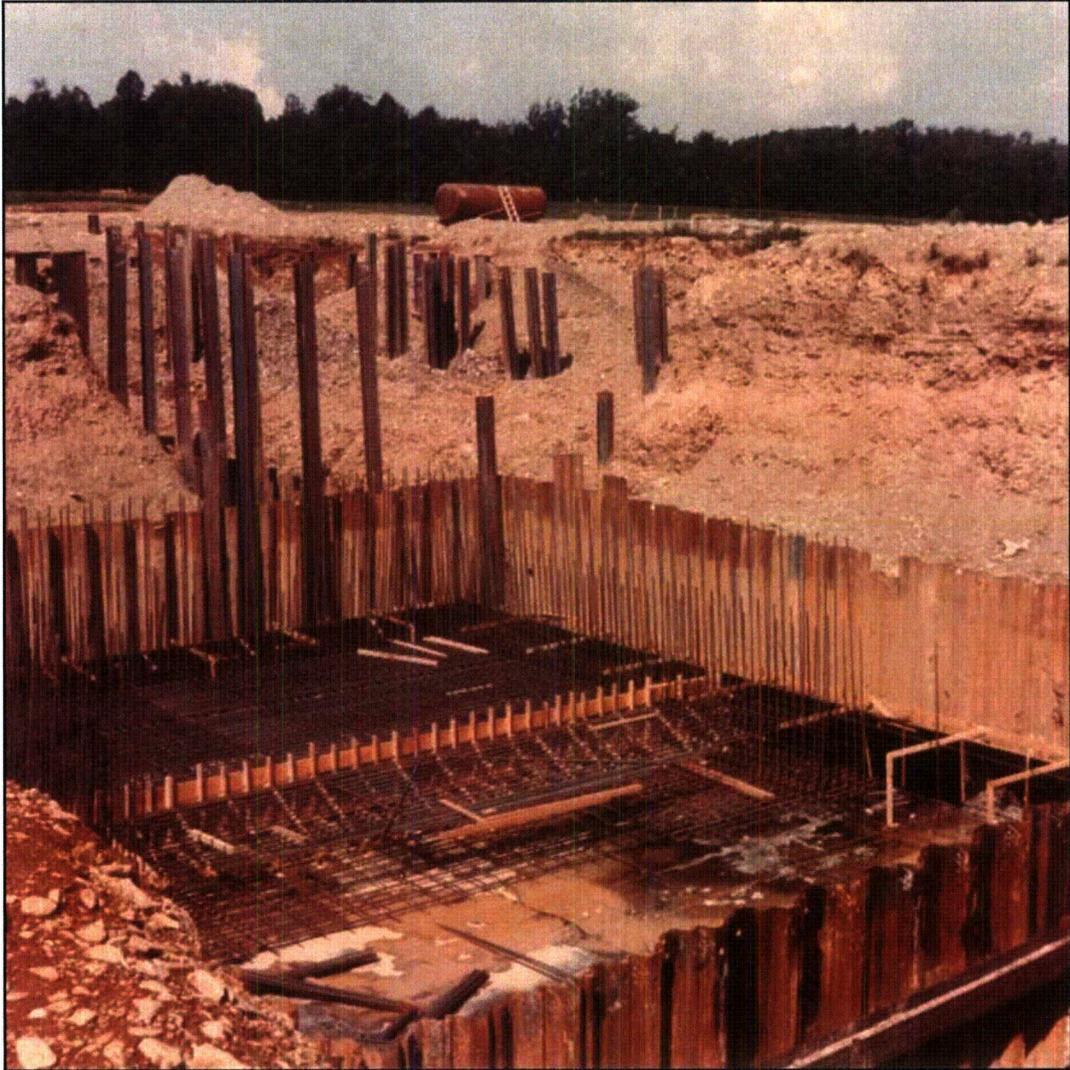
Sheet Piling Supporting the Fuel Storage Pool Excavation Looking to the West
